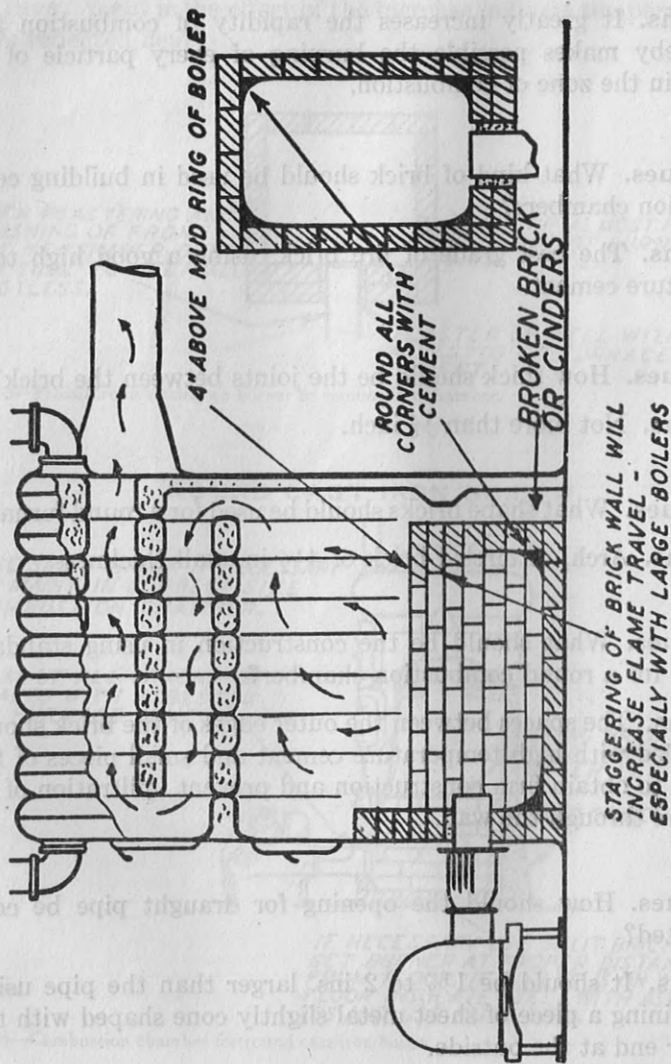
Combustion chamber for horizontal cast iron boiler.
